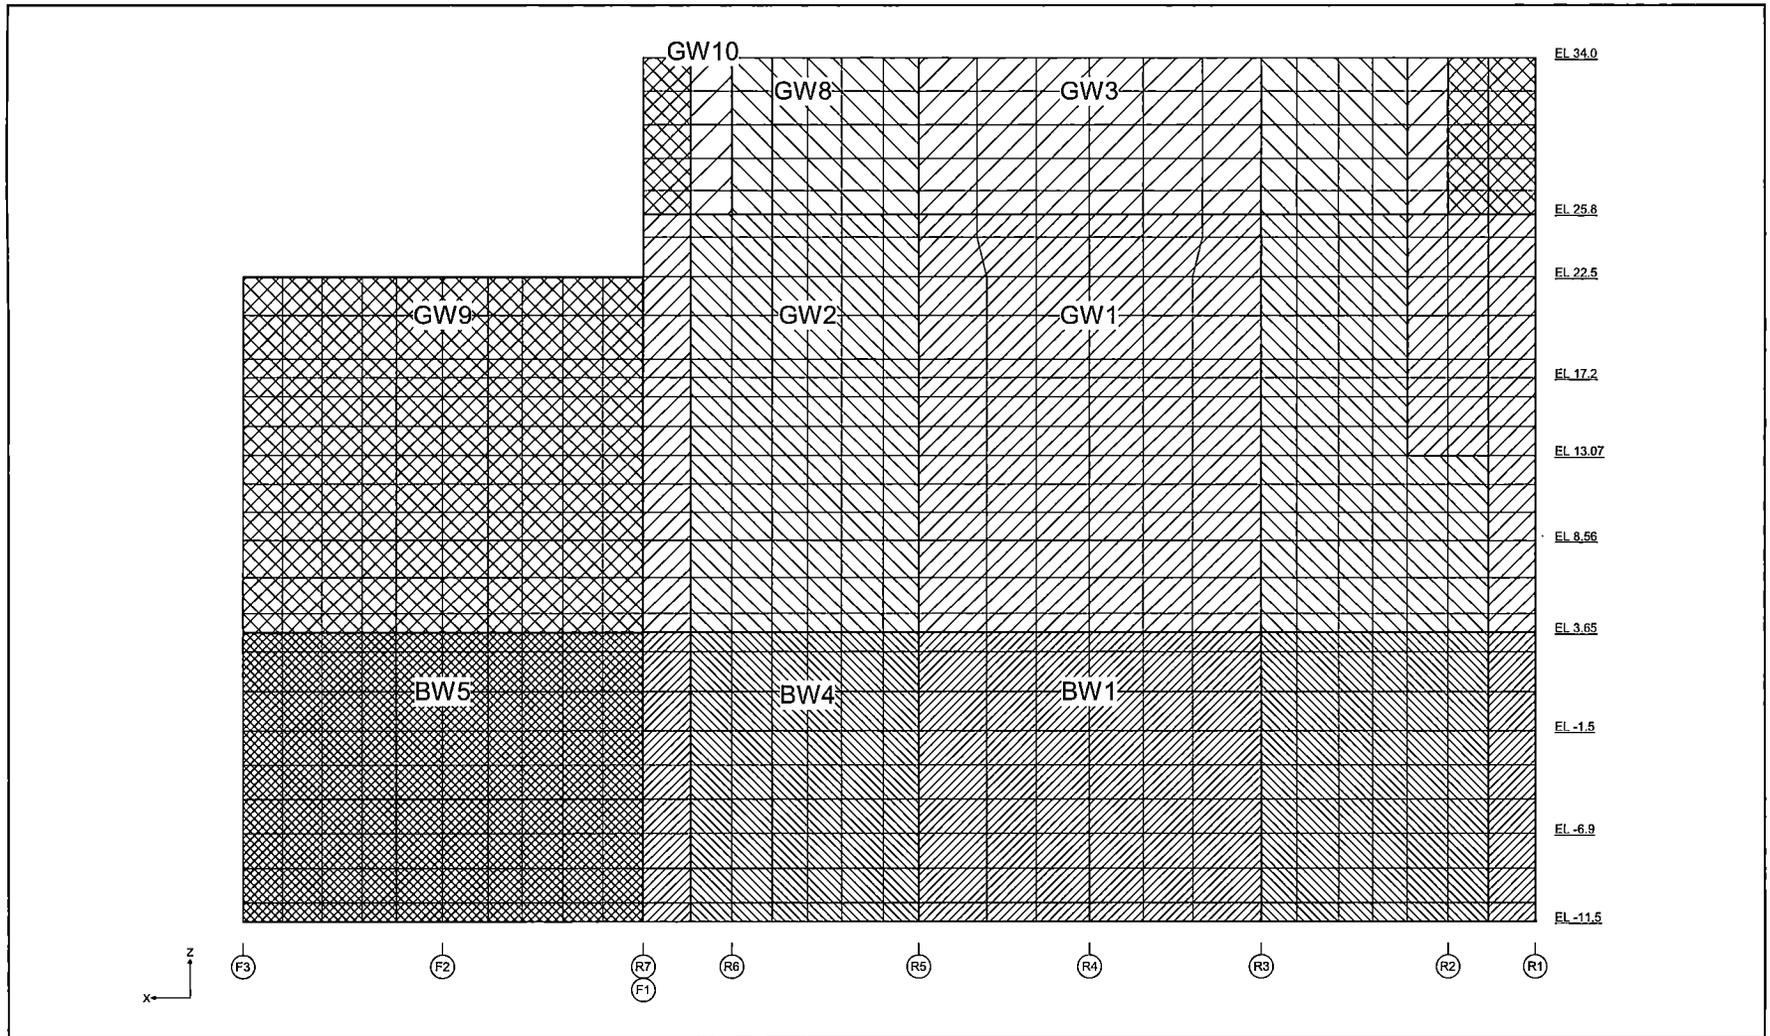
Application of Thermal Load on the External Wall (RA)
